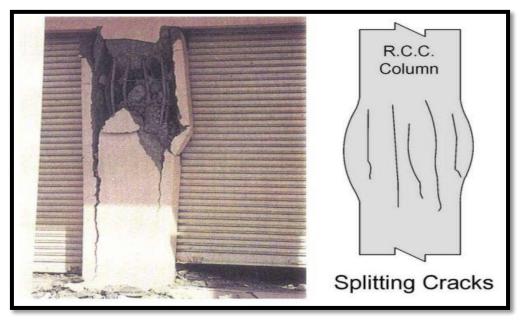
Splitting Crack In The Concrete Column [3] [4]
